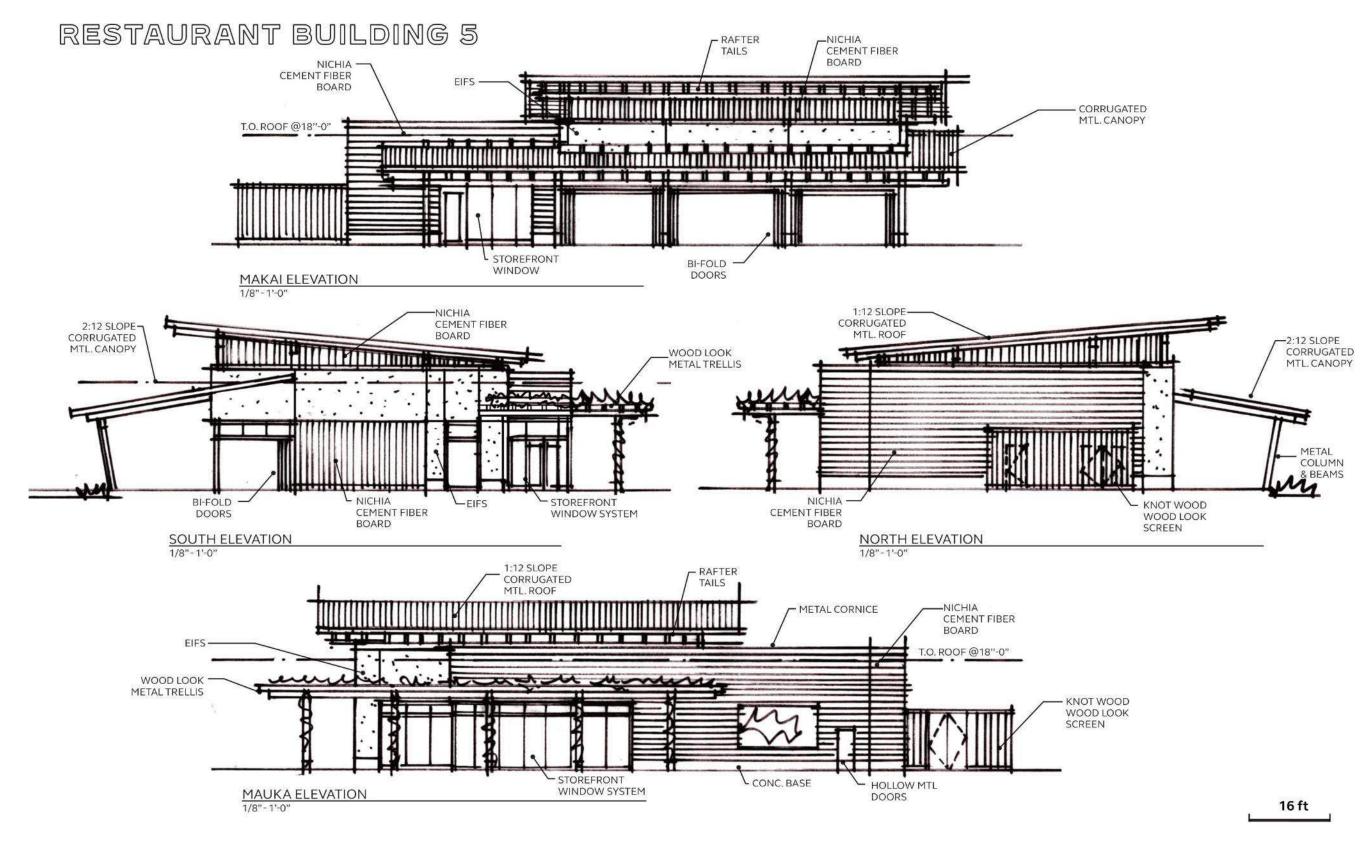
Restaurant Building 5 – Preliminary Elevation
